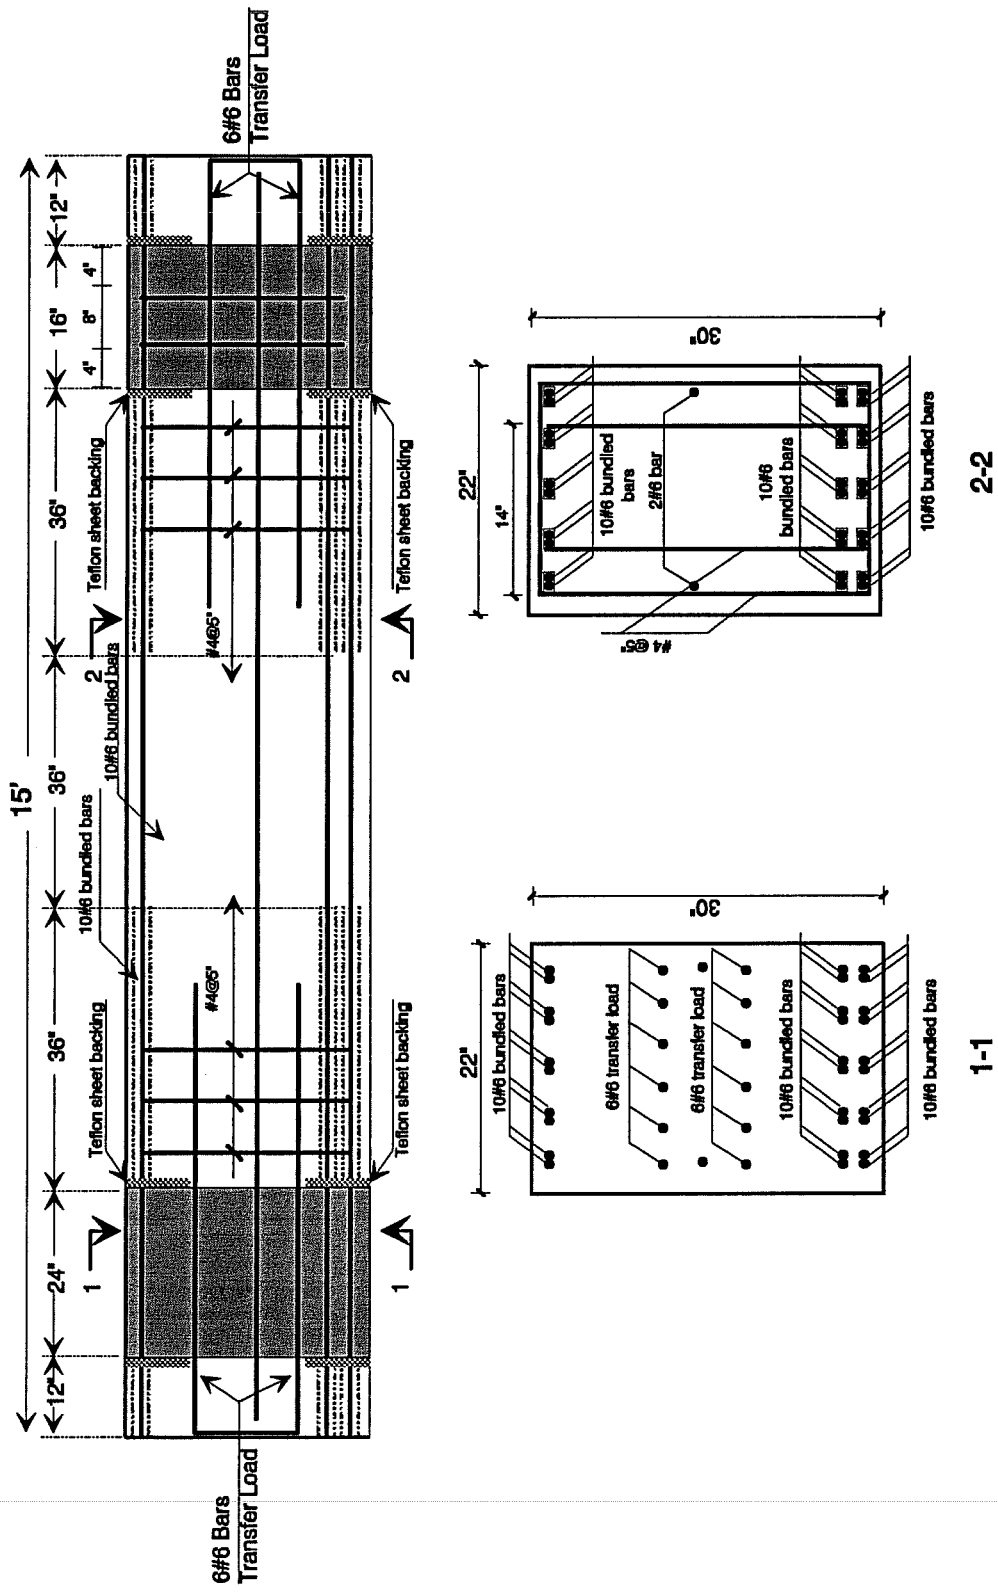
Details of specimen #3 (with teflon sheet, design for shear)
